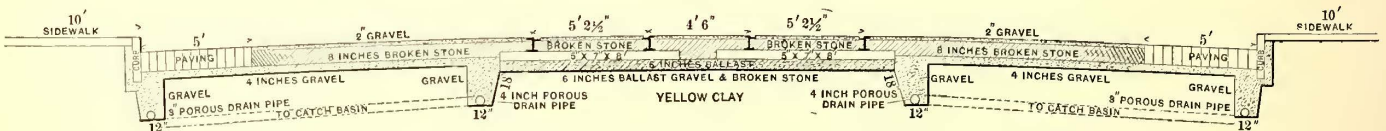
SECTION OF TRACK CONSTRUCTION—CINCINNATI, NEWPORT & COVINGTON RAILWAY.
